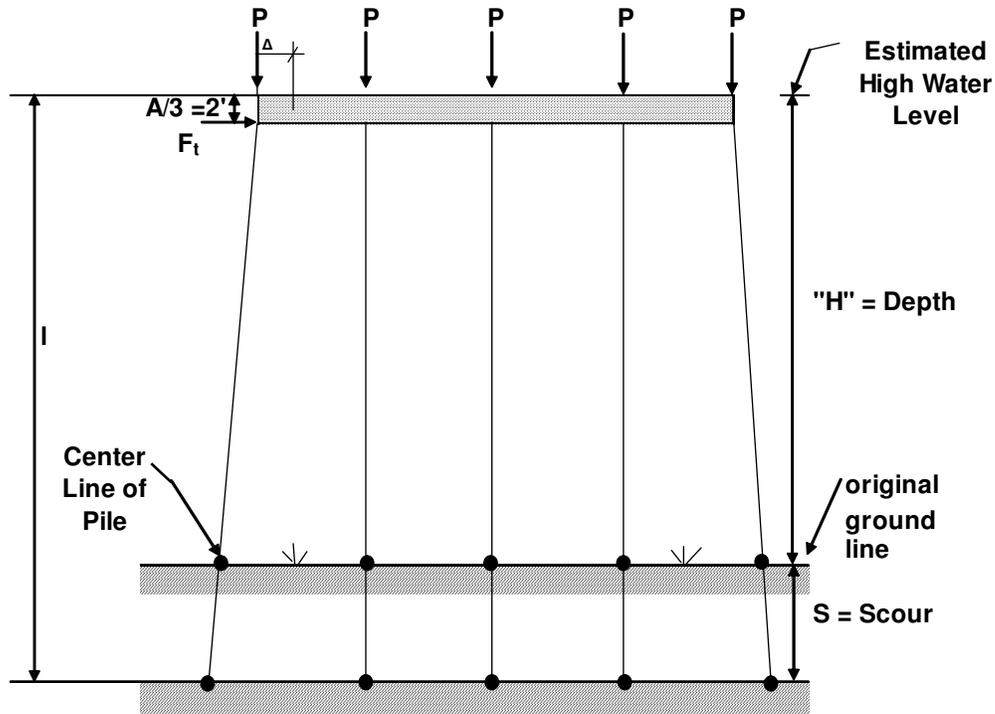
Typical Unbraced Bent and Typical Loading Conditions
